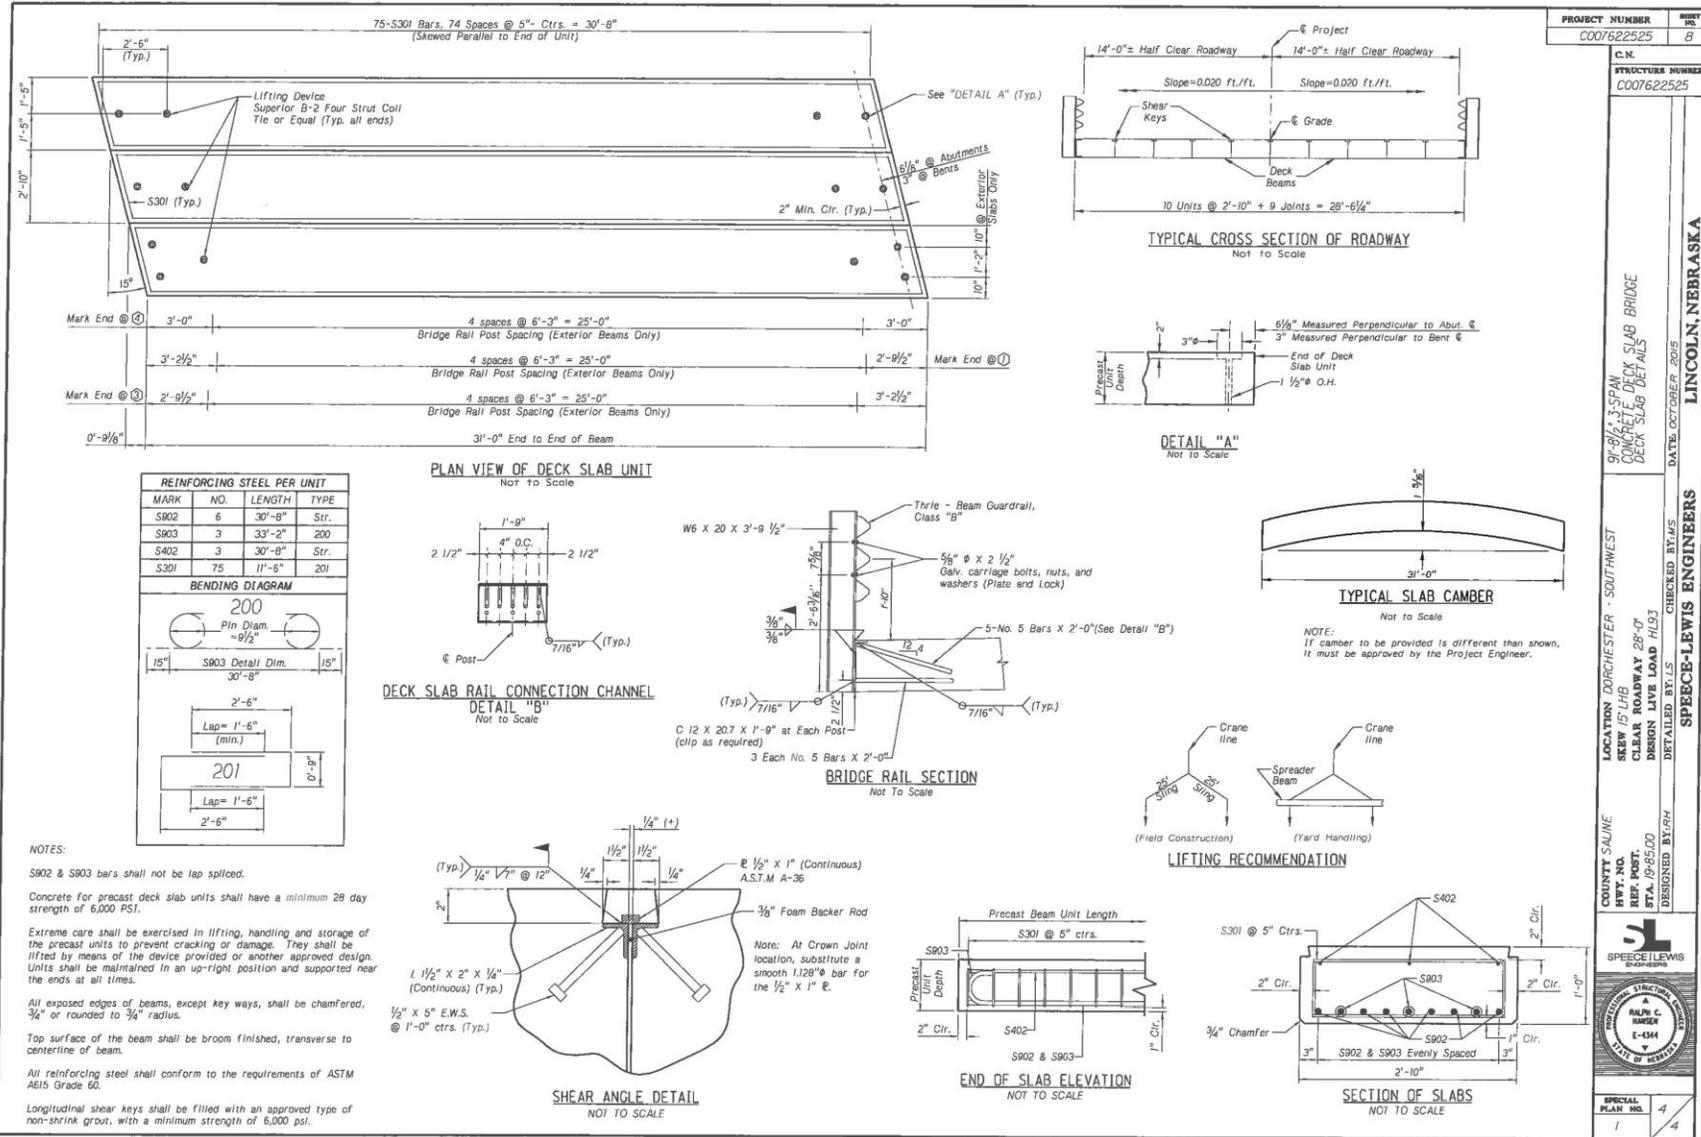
Example Details for 12-in. Thick Precast Beam-Slab Deck
